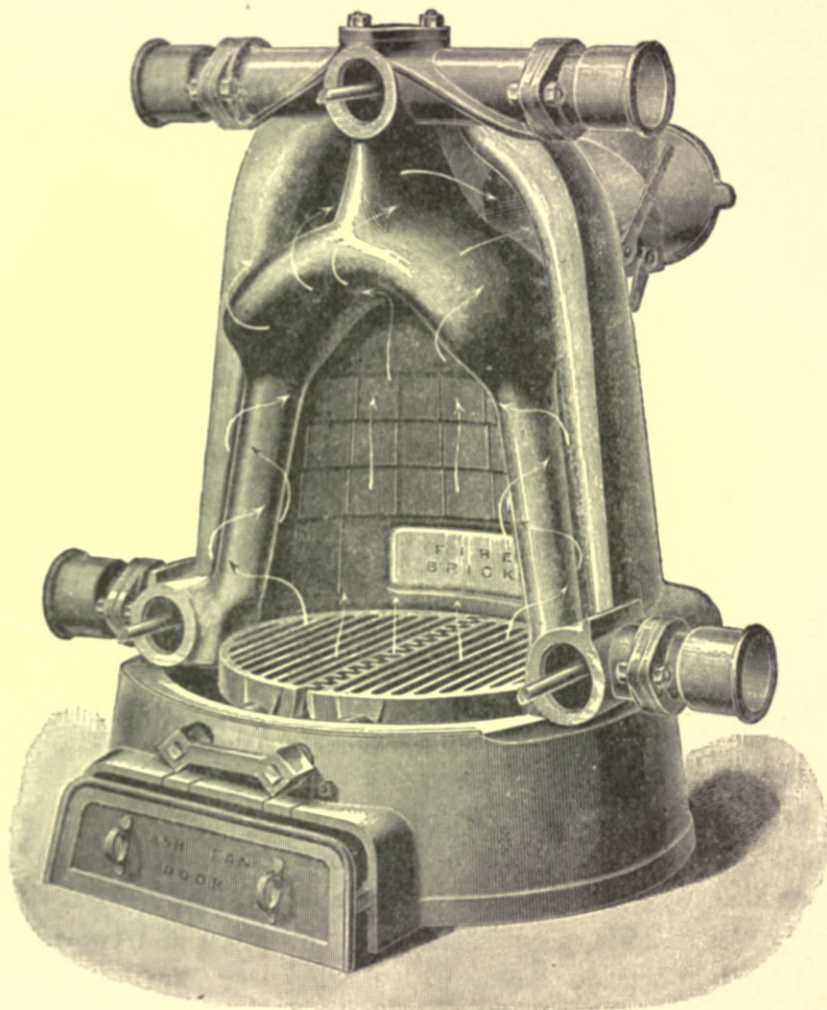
View of "Viaduct" Cast-iron Boiler, with the Front Half of the Outer Case Removed.
